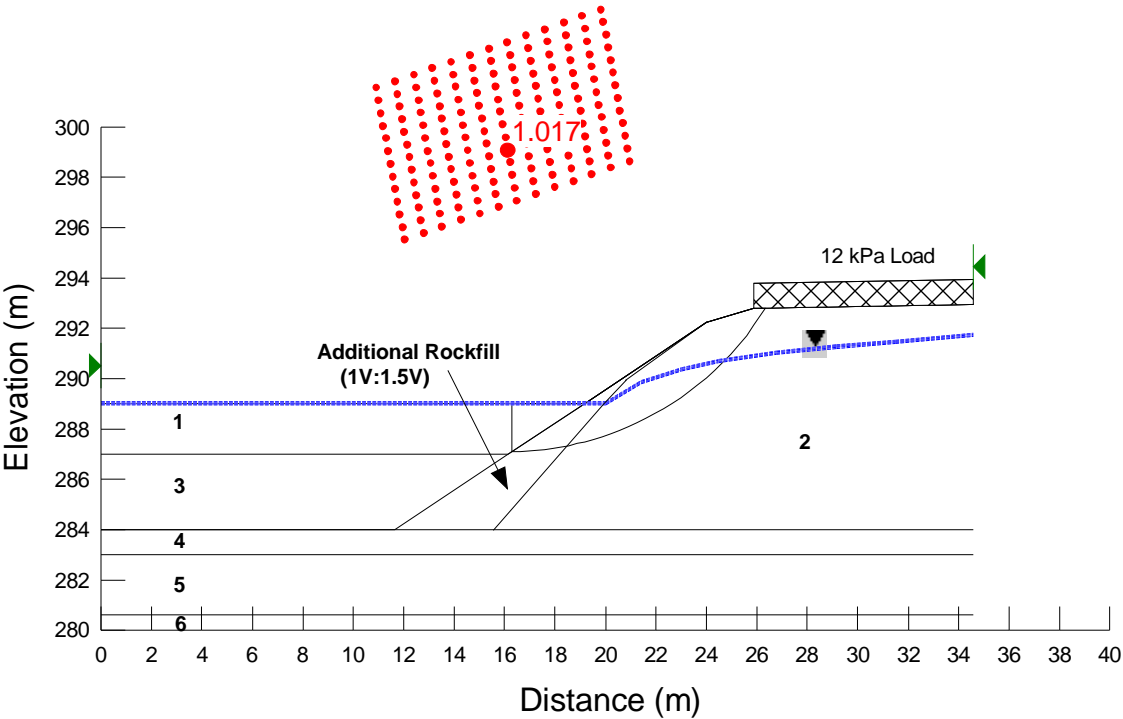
Stability of HWY11 Road Section at Sta. 14+850
